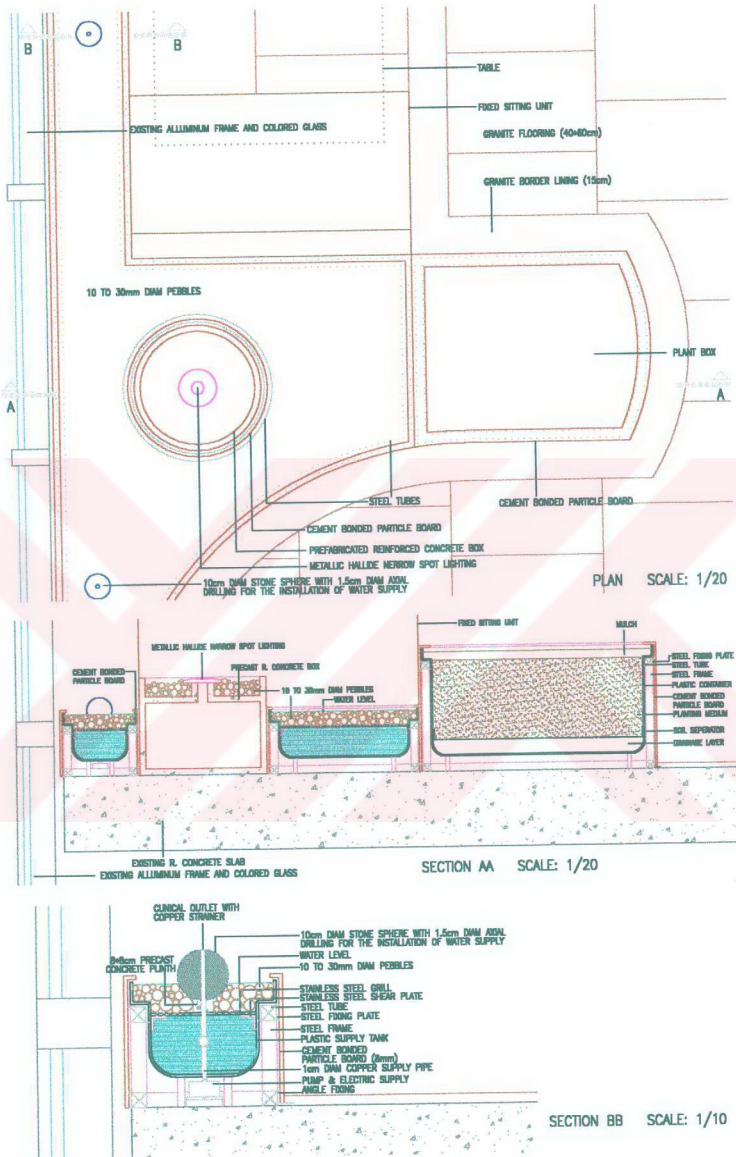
The detail drawing of water element, plant box and lighting feature.
